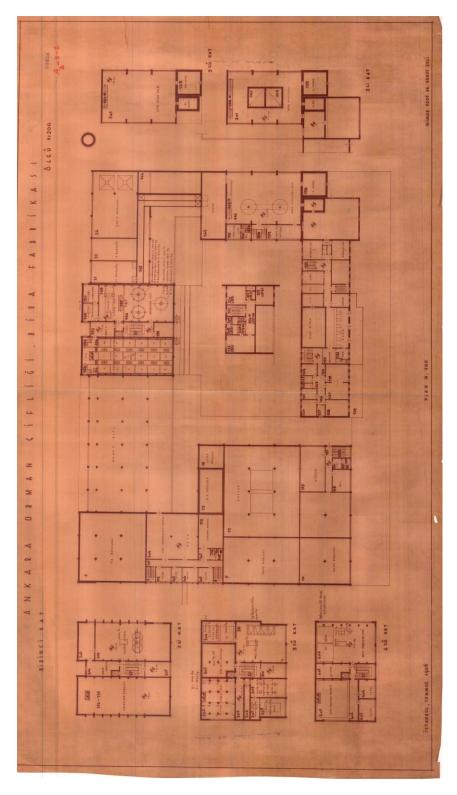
The original drawings of the brewery, first floor plan (Source: T.T.A Archive)
